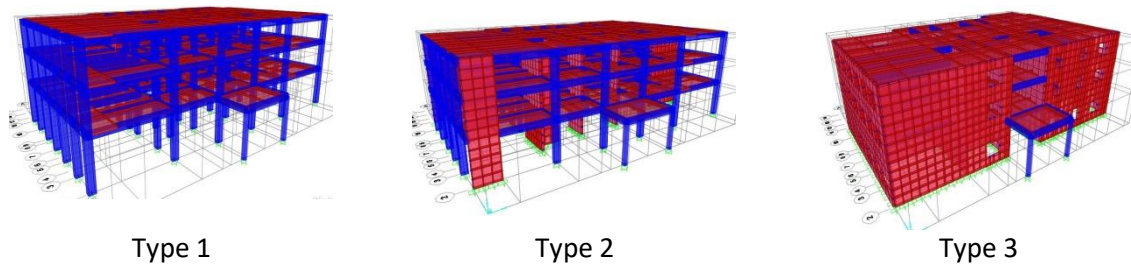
Frames with only (RC) columns (Type 1), with RC columns and Shear Walls (Type 2), only with Shear Wall (Type 3) 3D views
